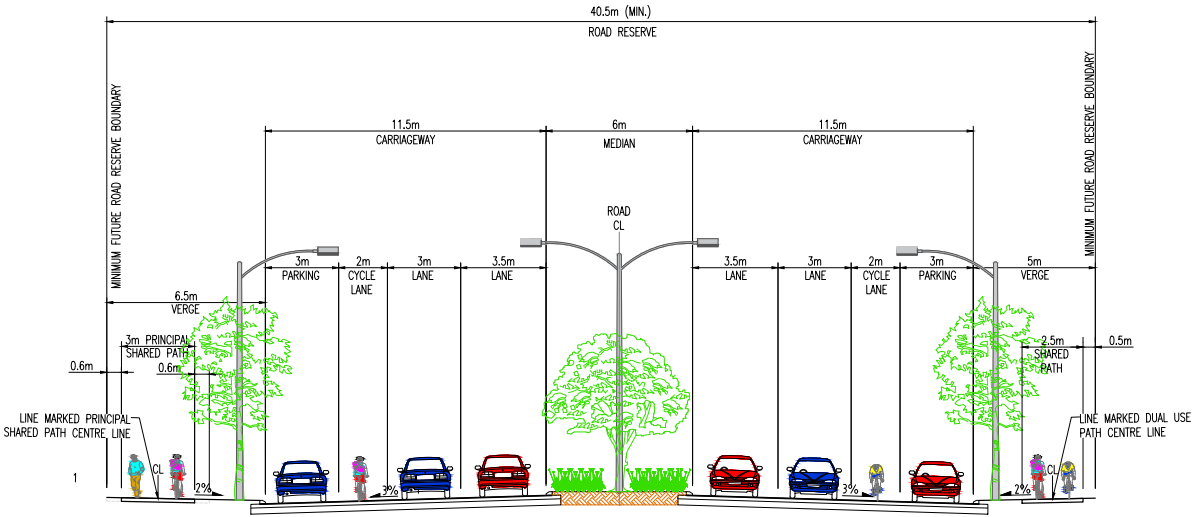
CROSS SECTION FRANKLIN ROAD (NEIGHBOURHOOD CENTRE)
